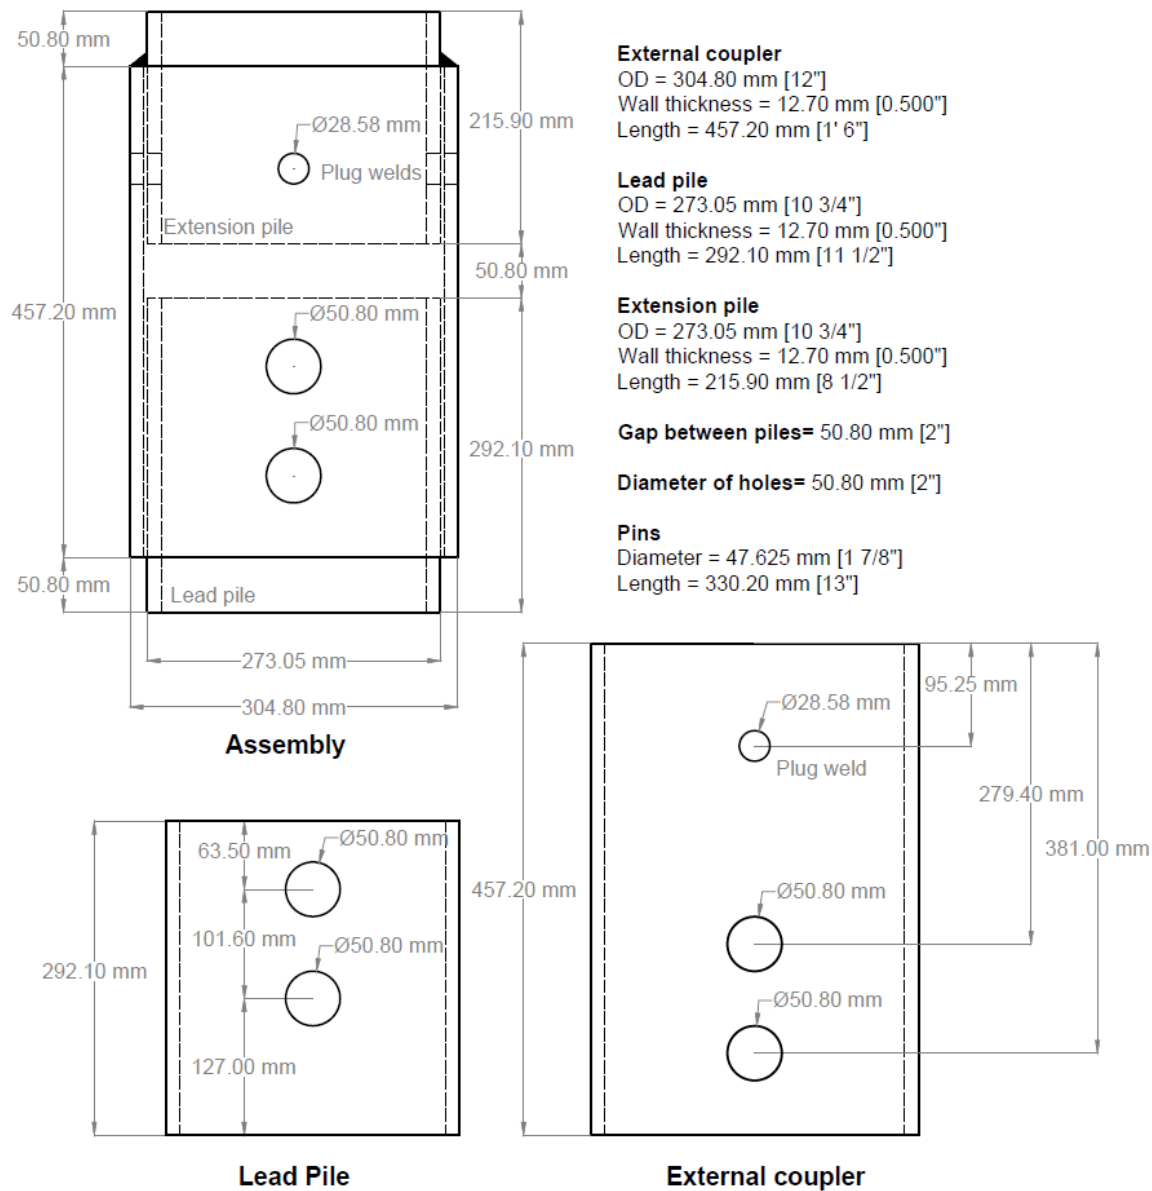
5. Final dimensions of the components in mechanical connection.
